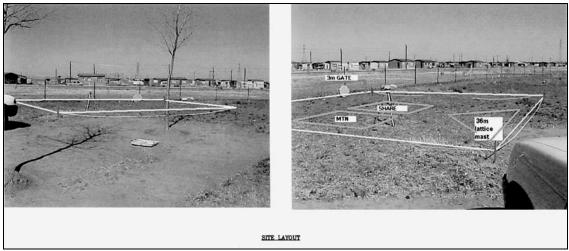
Site layout of the proposed MTN mast at Pumlani Cemetery, Thabong, Welkom.
